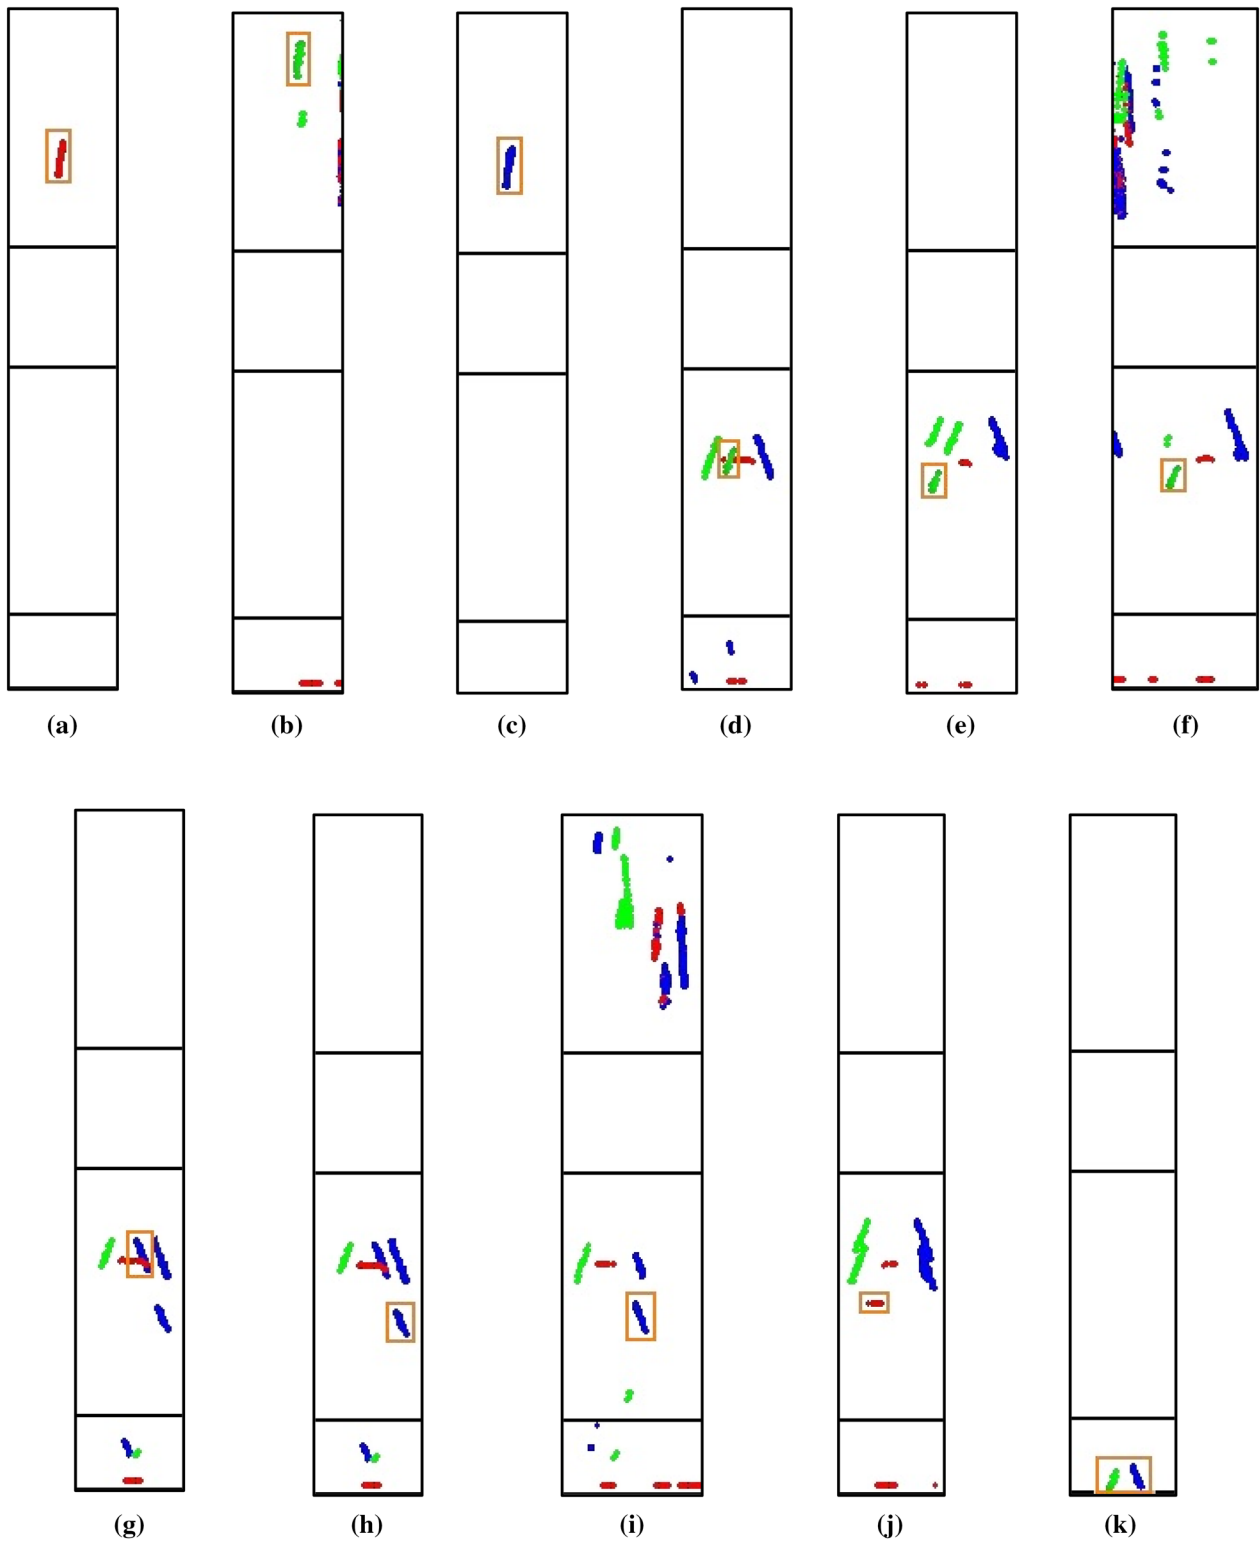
Rail defects in B-scan images: (a) Inside flaw of rail head, (b) Middle flaw of rail head, (c) Outside flaw of rail head, (d) Upper crack on the inside of the screw hole, (e) Lower crack on the inside of the screw hole, (f) Inverted lower crack on the inside of the screw hole, (g) Upper crack on the outside of the screw hole, (h) Lower crack on the outside of the screw hole, (i) Inverted lower crack on the outside of the screw hole, (j) Horizontal crack of screw hole, (k) Rail bottom transverse crack
